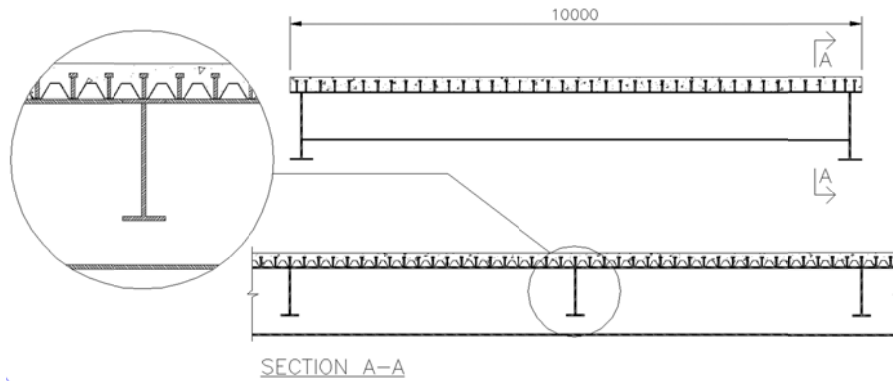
Configuration of the deck and girders with shear studs and trapezoidal profiles.
